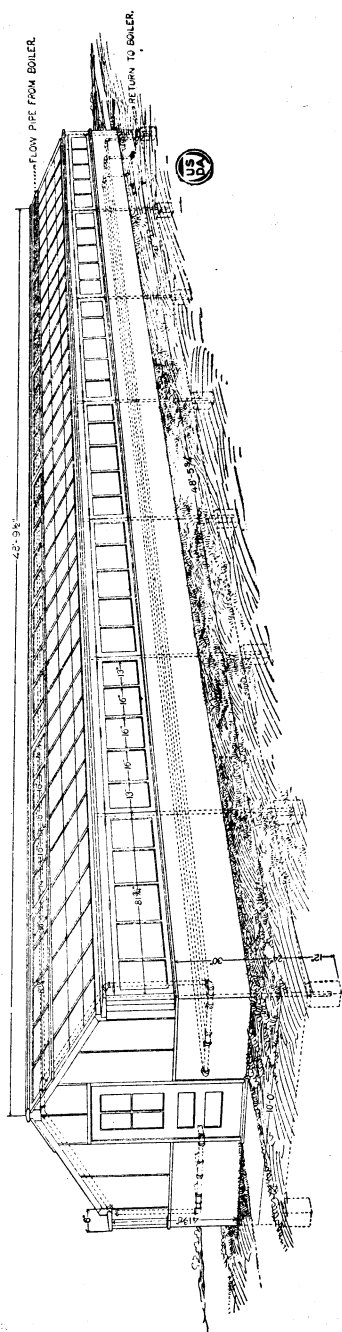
A 10-foot detached house well suited to the needs of the beginner.
